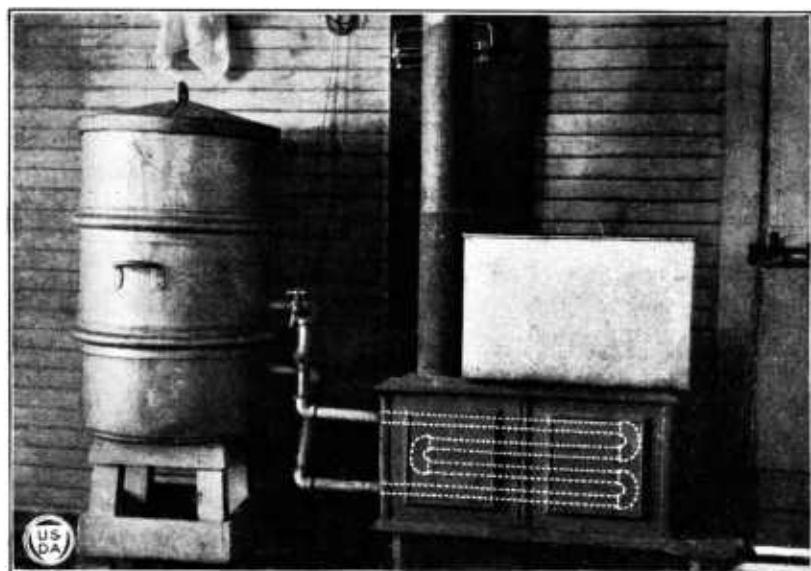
Homemade hot-water installation consisting of four lines of 1-inch black wrought pipe about 24 inches long joined by return bends and placed in a wood-burning stove and connected to a galvanized steel gasoline barrel 19 inches in diameter and 34 inches high; the barrel is supplied with cold water by pouring from a pail at the top; hot water is drawn at the faucet.
